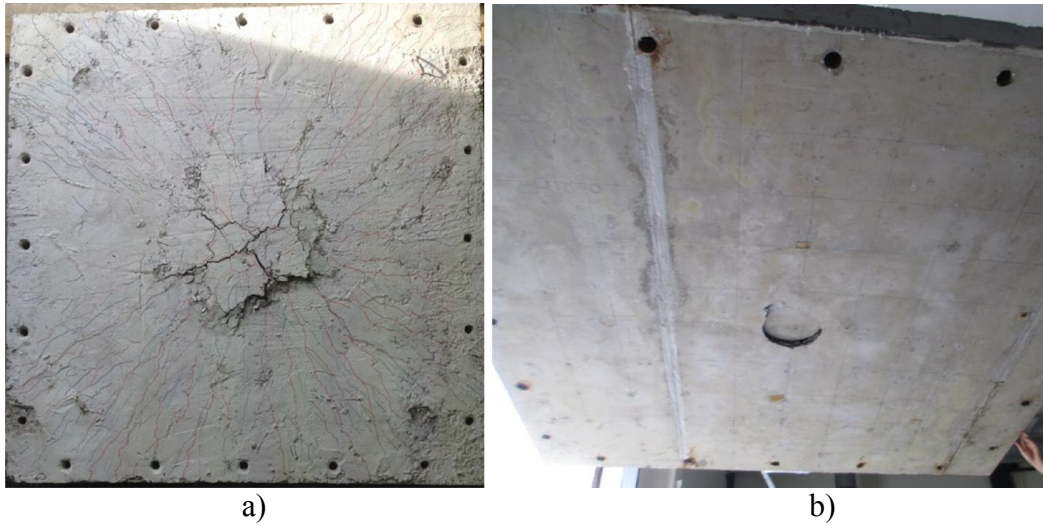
a) Front face of specimen YA200fa after testing, b) Loading face of the specimen YA200fa after testing
